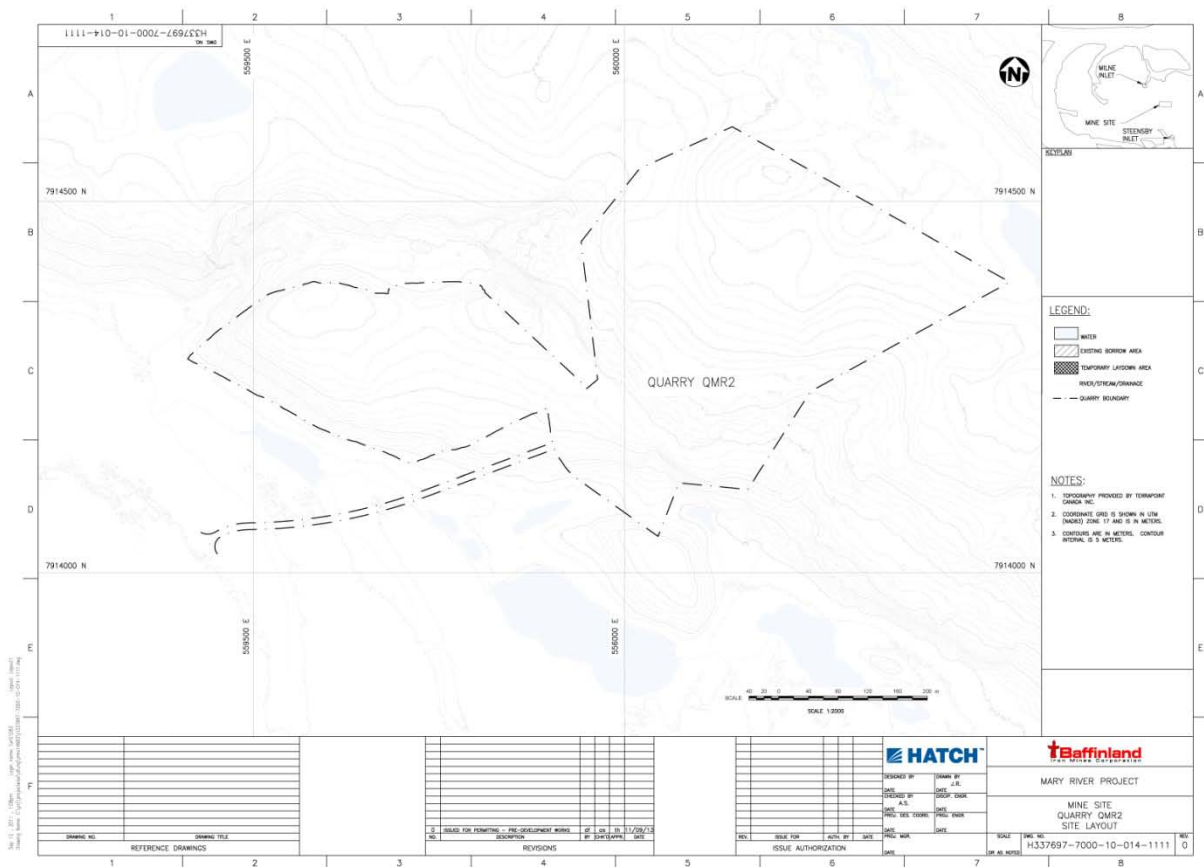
Mary River Mine Site - Quarry QMR2 Site Layout
